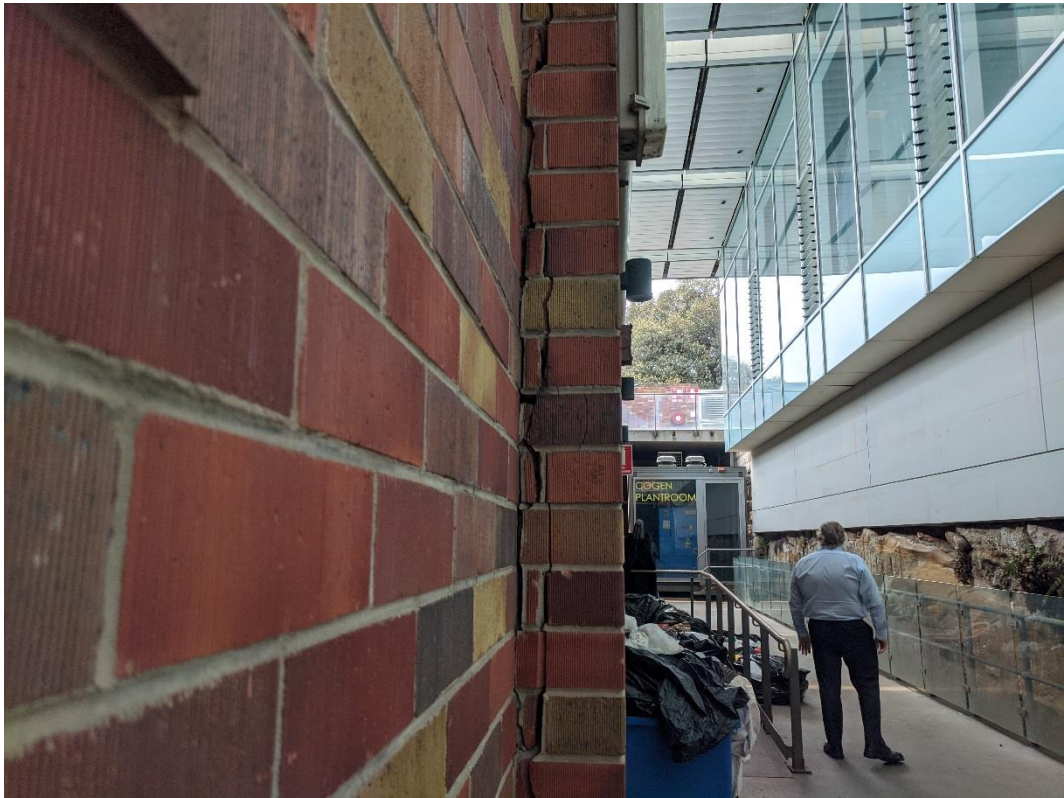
Cracking to Masonry Skin to Grandstand Concrete Column (Likely Corrosion of Reinforcement)
